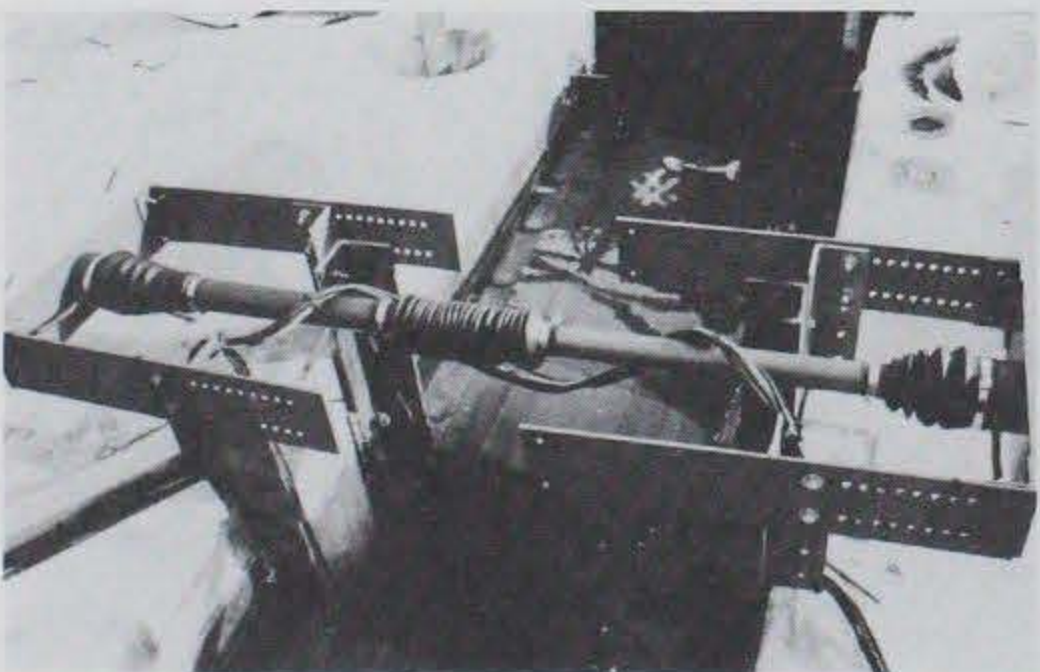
Photo showing relative motion sensor which was used when the horizontal fender connector was tested.
